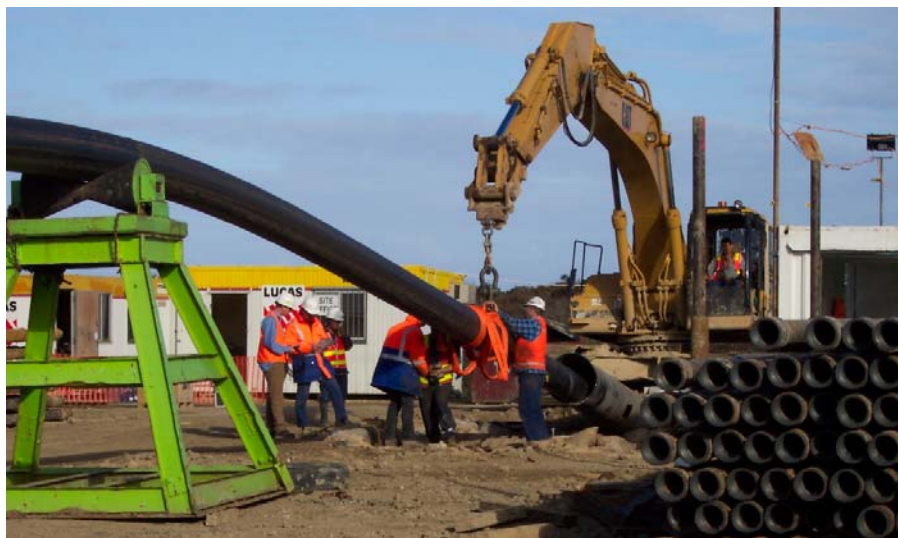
Photograph of Excavator and Sling Installing Casing Pipe
